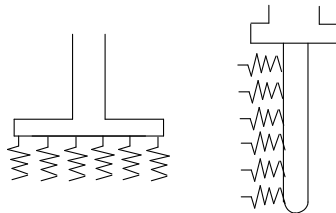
Whether on a footing or piles, a foundation has a certain stiffness  $k_{soil}$
